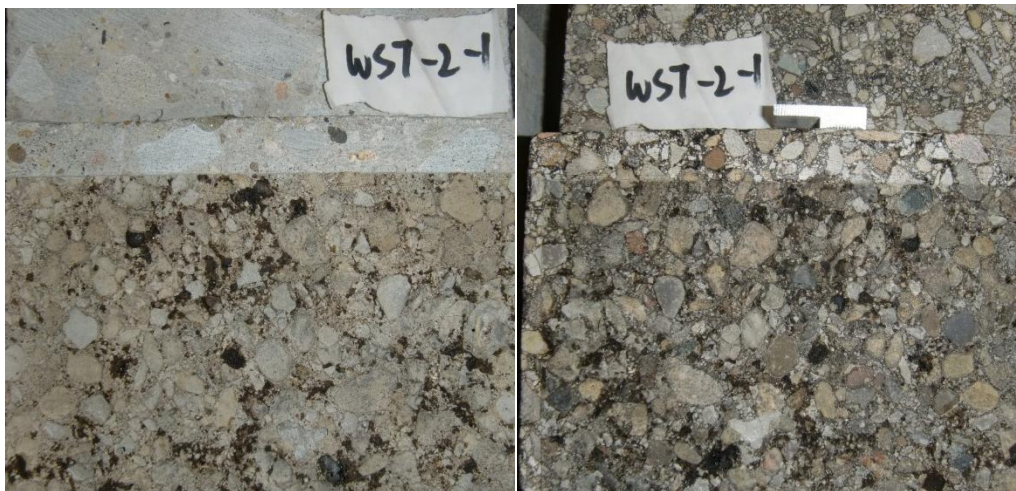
Failure surfaces of unmilled, dry and room-temperature specimen, WST-2-01.
